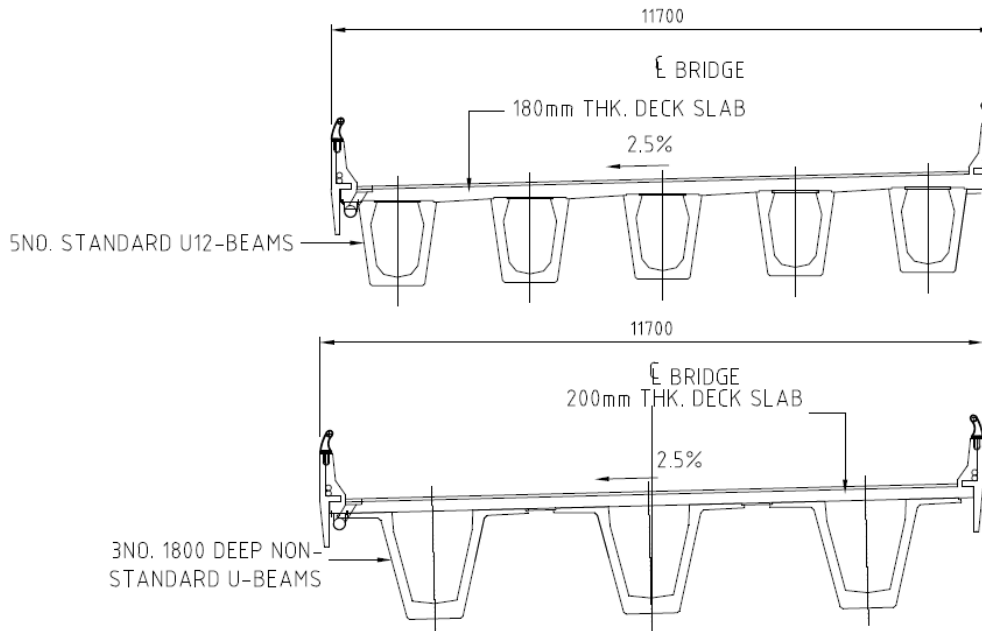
Typical cross sections of precast Super U-beam and “U10” U-beam.
